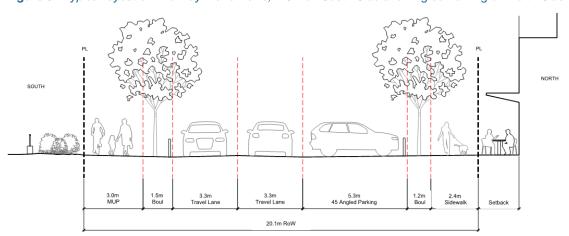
Typical Section with Two-way Travel Lane, MUP on South Side and Angled Parking on North Side
